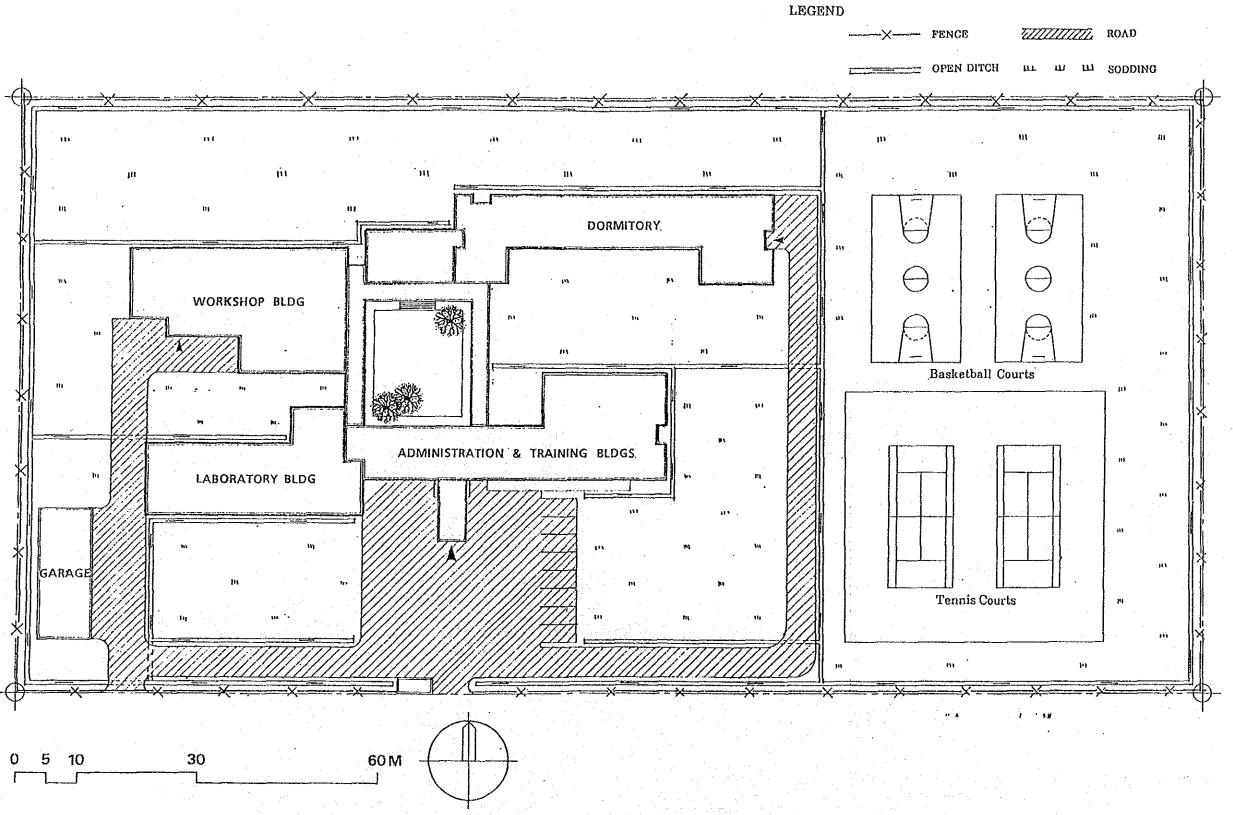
LAYOUT OF COAL MINING TECHNOLOGY DEVELOPMENT CENTER
